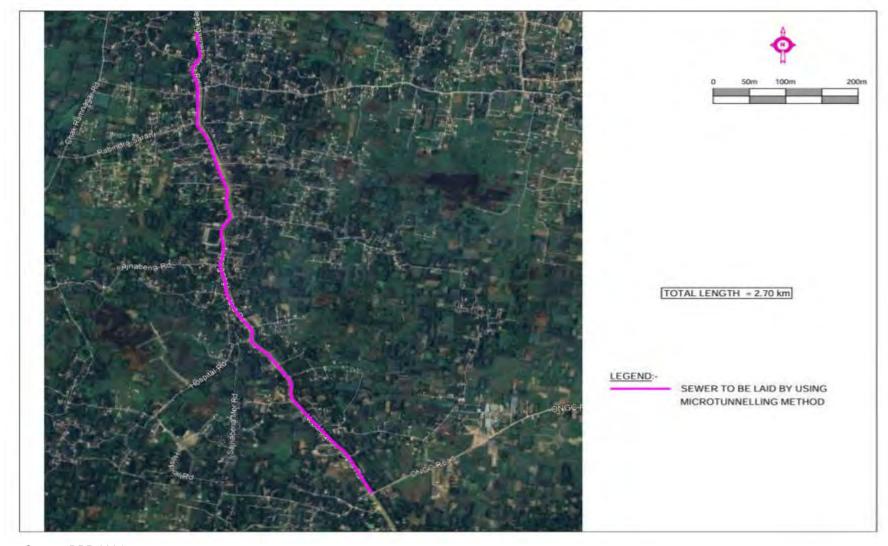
Proposed Sewer Pipe laying by Micro tunneling and Jack pushing in Julpia Catchment
